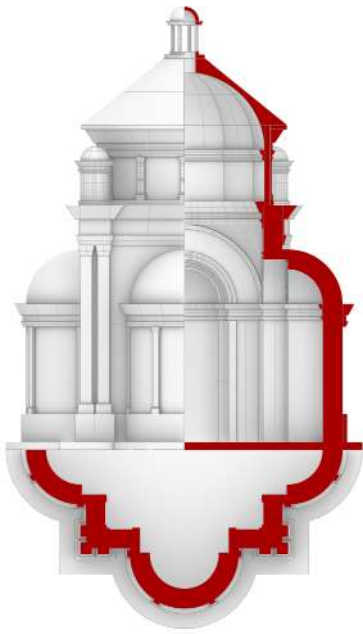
Plan, section and elevation (1:500) of the solution with a cloister dome and an exterior circle-based drum.
